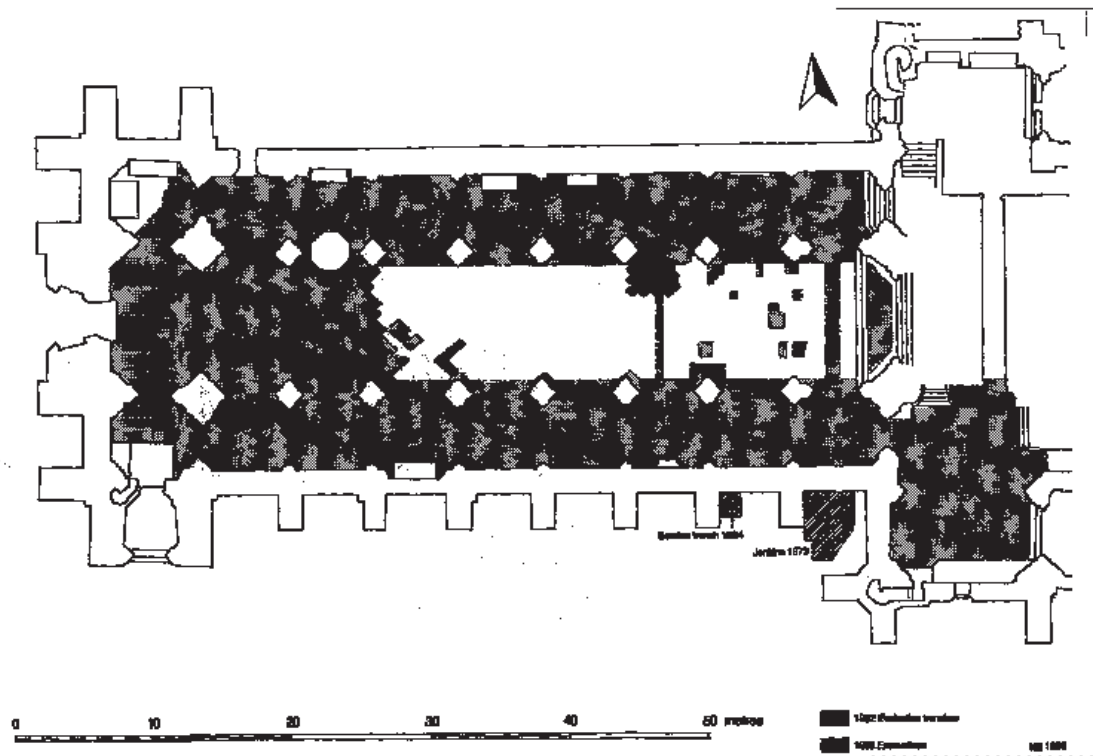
1993 location plan of excavations (Plan, Canterbury Archaeological Trust)
